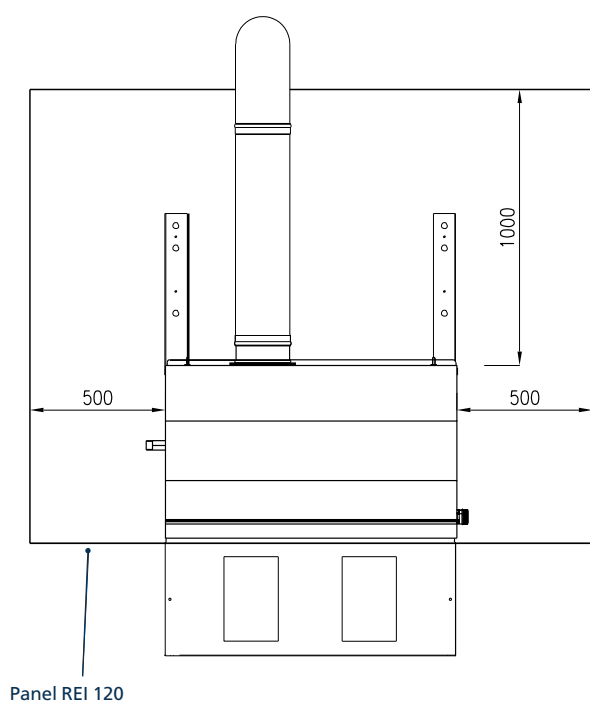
Front view of unit OHA with panel REI 120 dimensions
